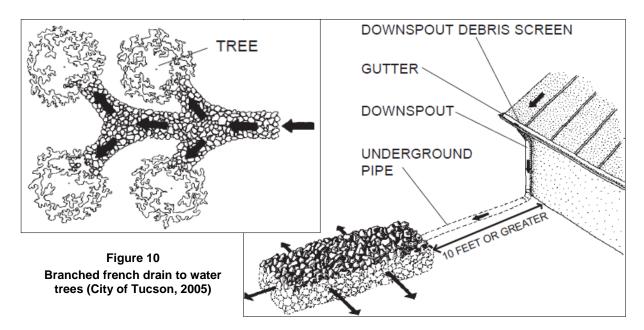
French drain minimum 3 m from building foundations (City of Tucson, 2005)
